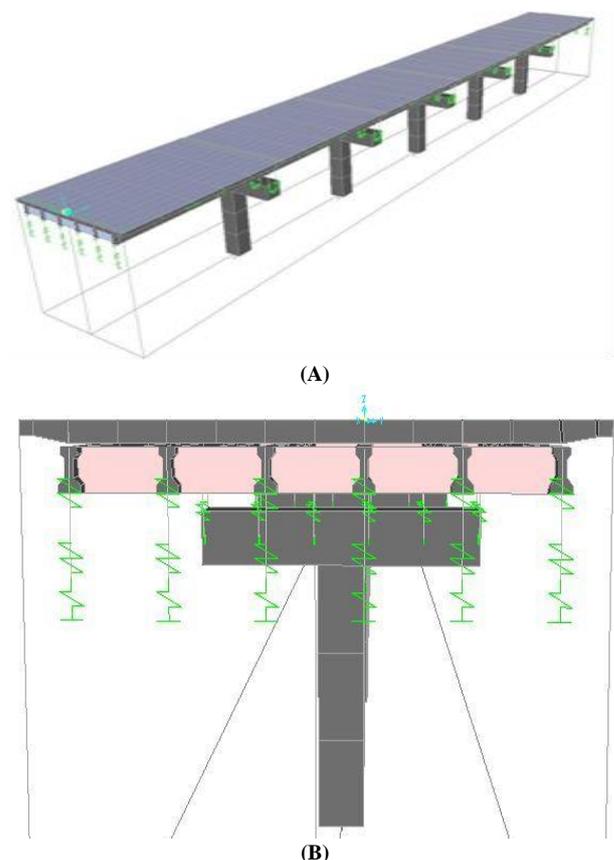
Simply-Supported I Girder Bridge Model: (A) Longitudinal Section, (B) Transverse Section.
